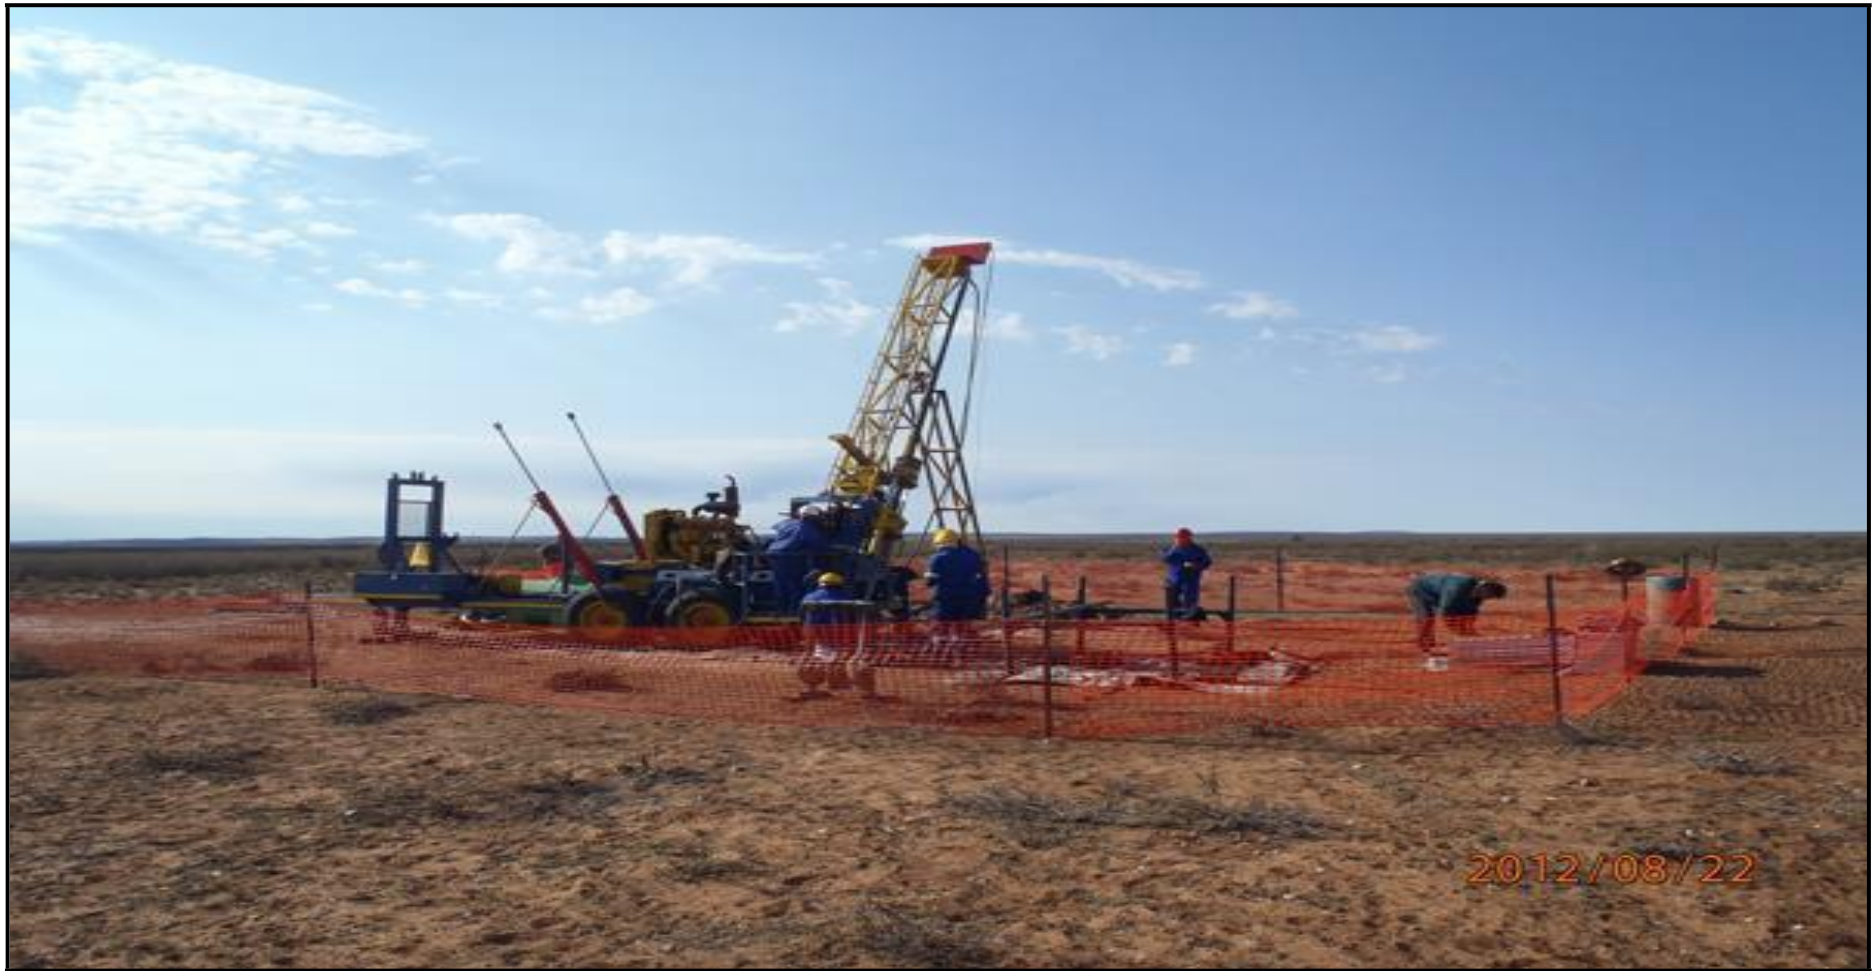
Shows a typical drilling site, drilling equipment's and personnel
